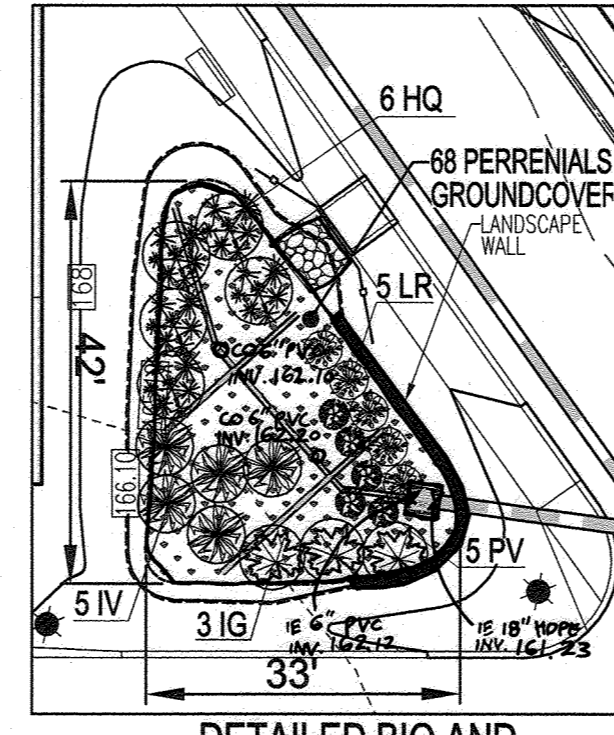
DETAILED BIO AND PLANTING PLAN (SWM #14A, 14B)
